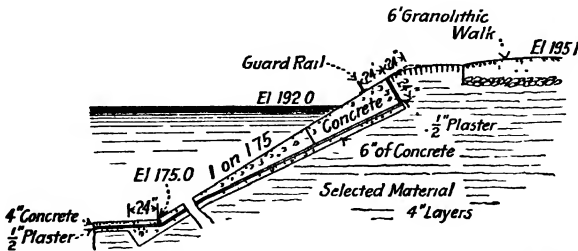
Paving, Forbes Hill Reservoir, Quincy, Mass.
